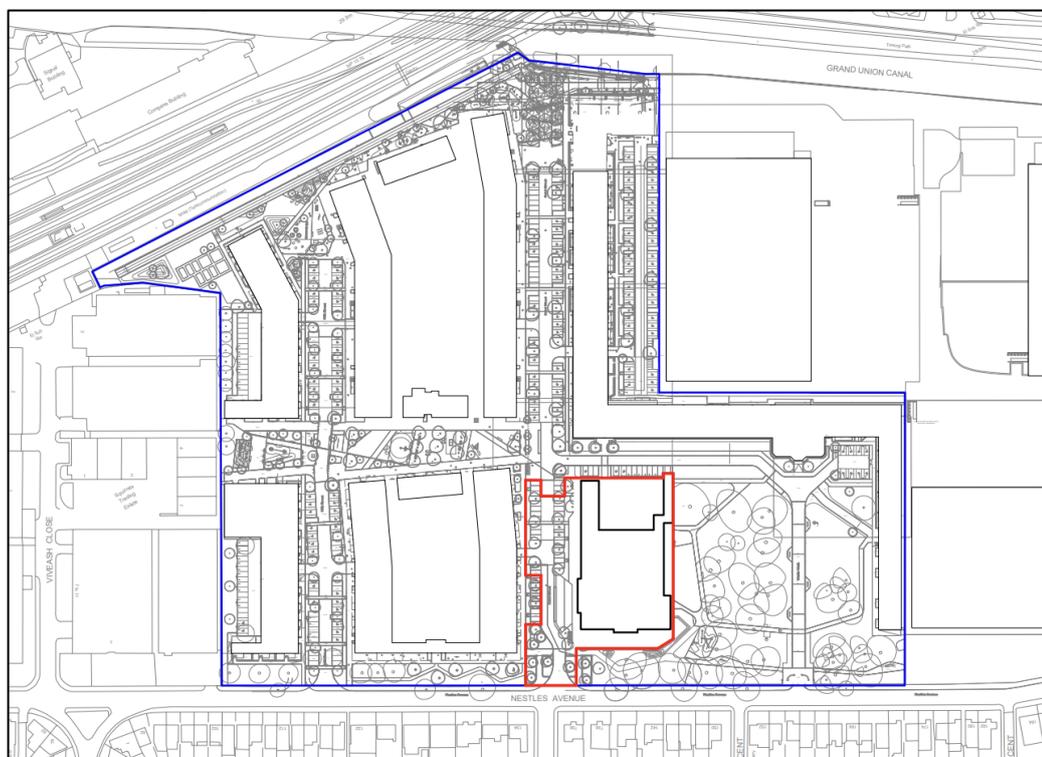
Site Plan (Application Site Outlined in Red)²
